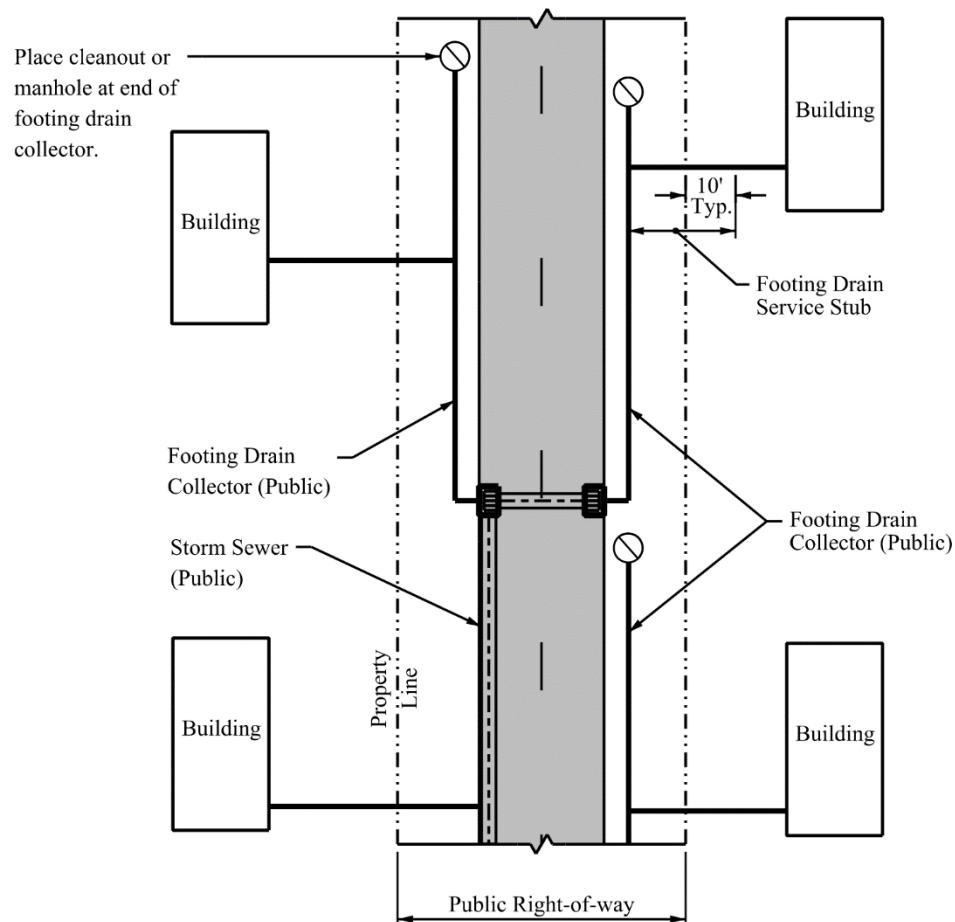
B-1.04: Example of Public and Private Storm Sewers
